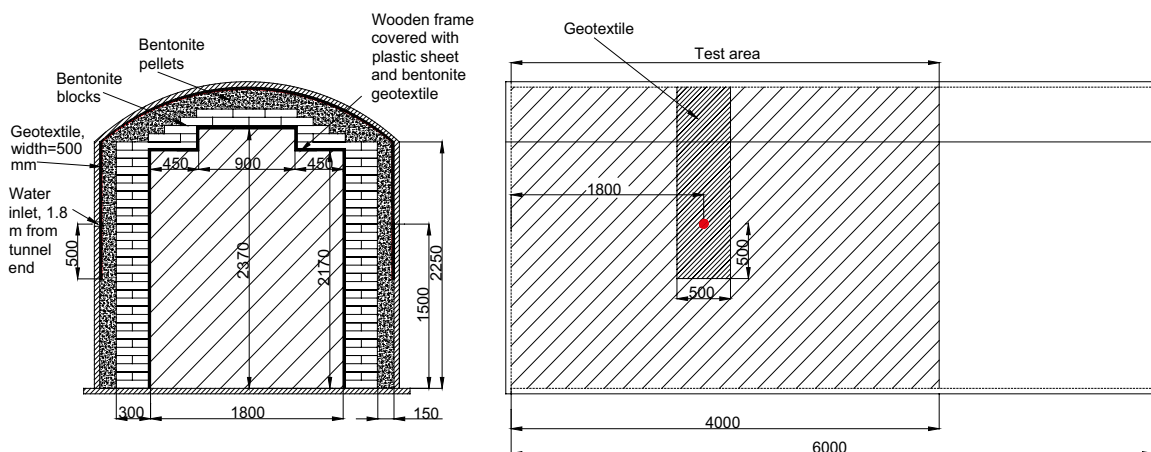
Schematic of the 1/2-scale test tunnel.
